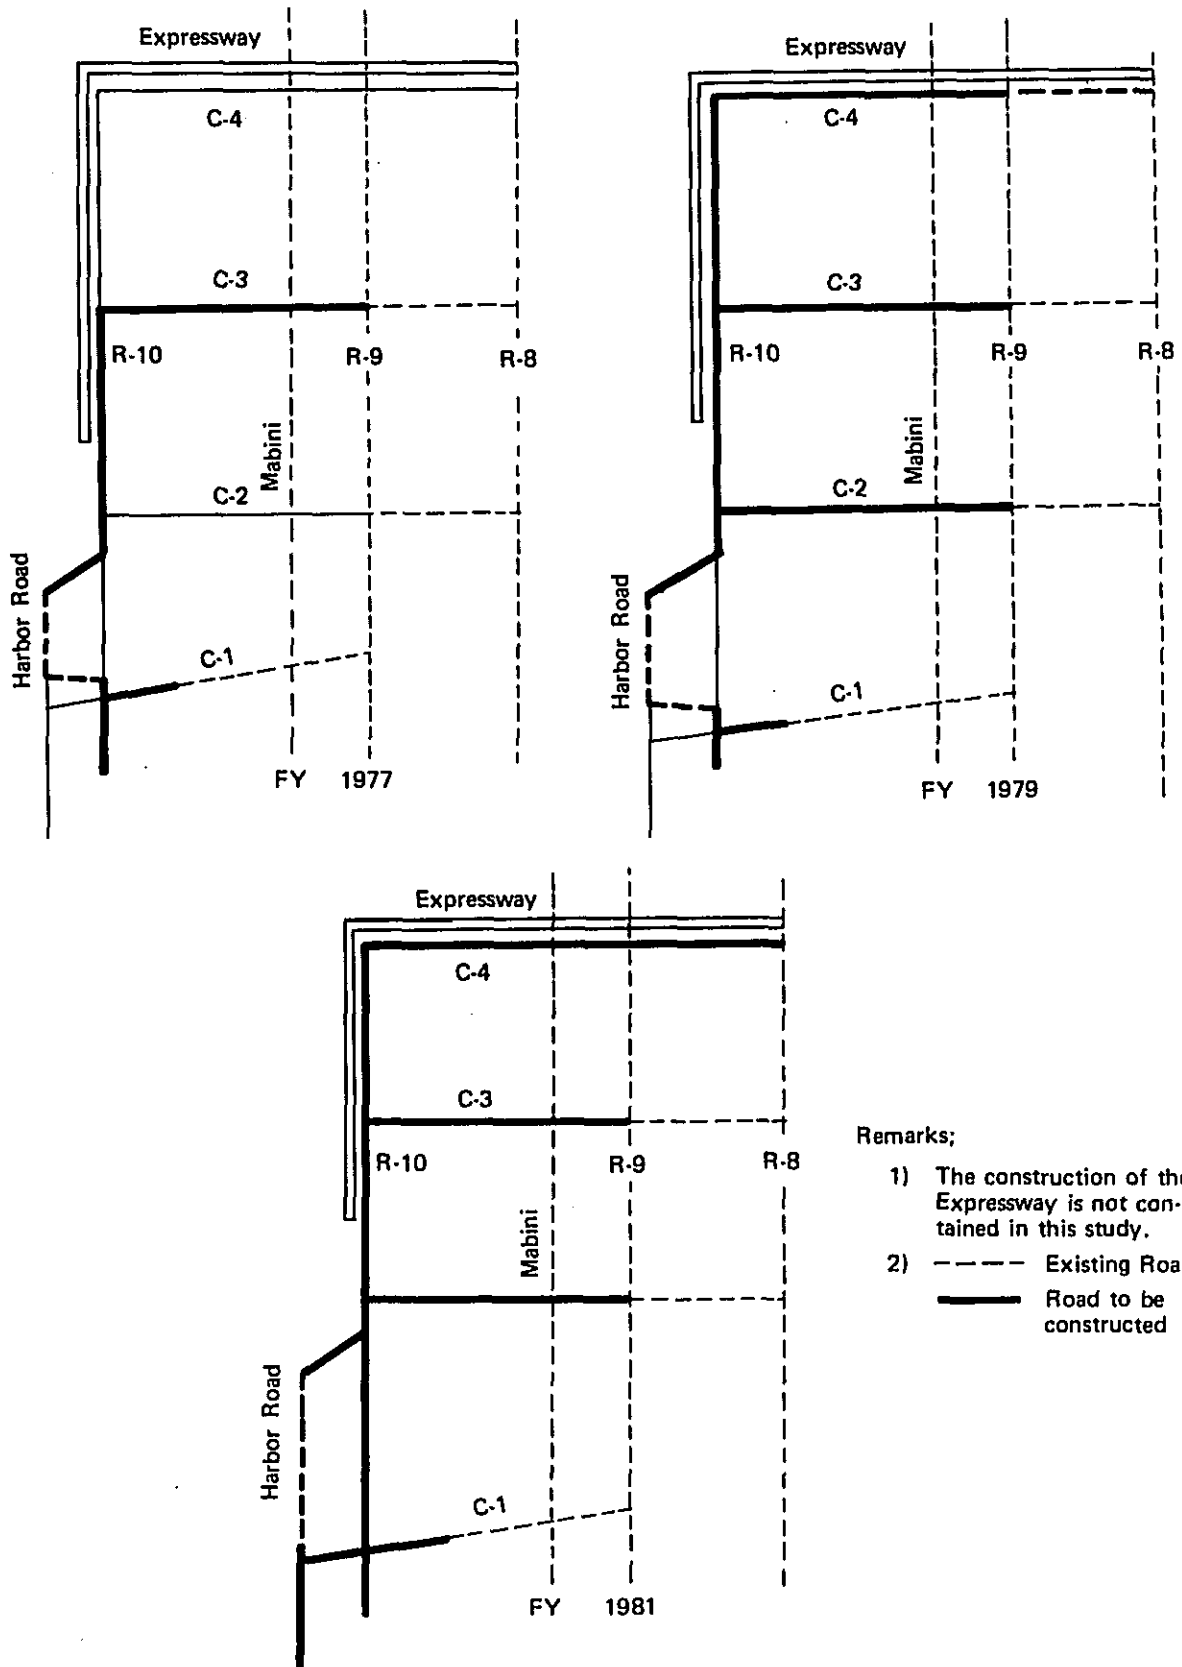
STAGE CONSTRUCTION PLAN OF PROJECT ROADS
